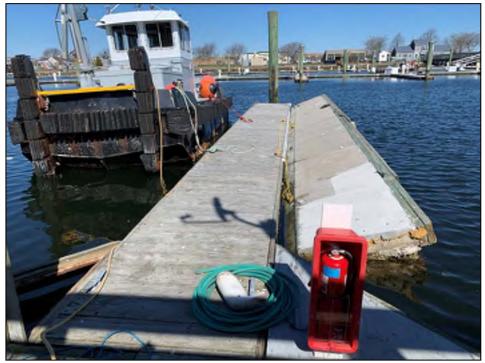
New timber finger float with abandoned concrete finger float at Dock D.
